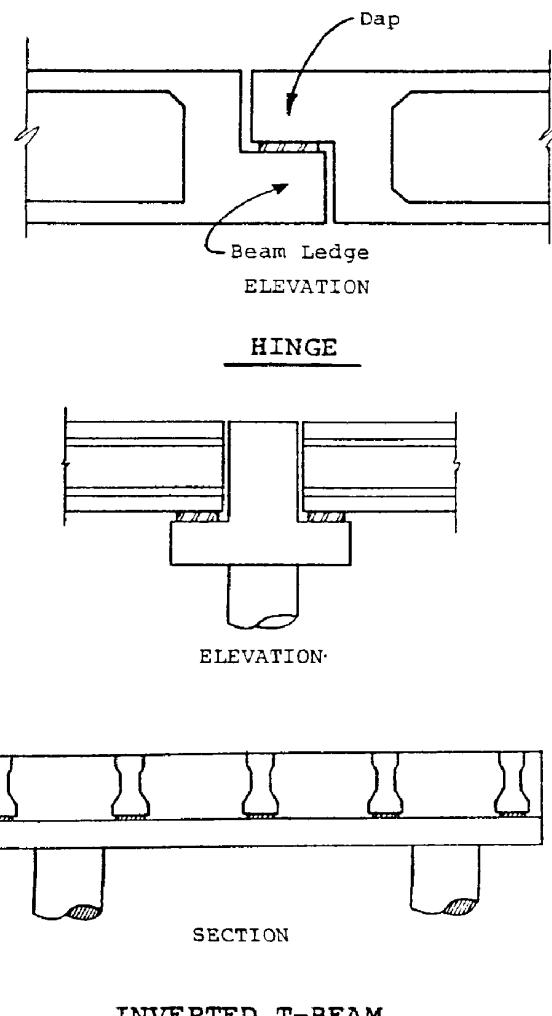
Examples of Beam Ledges
